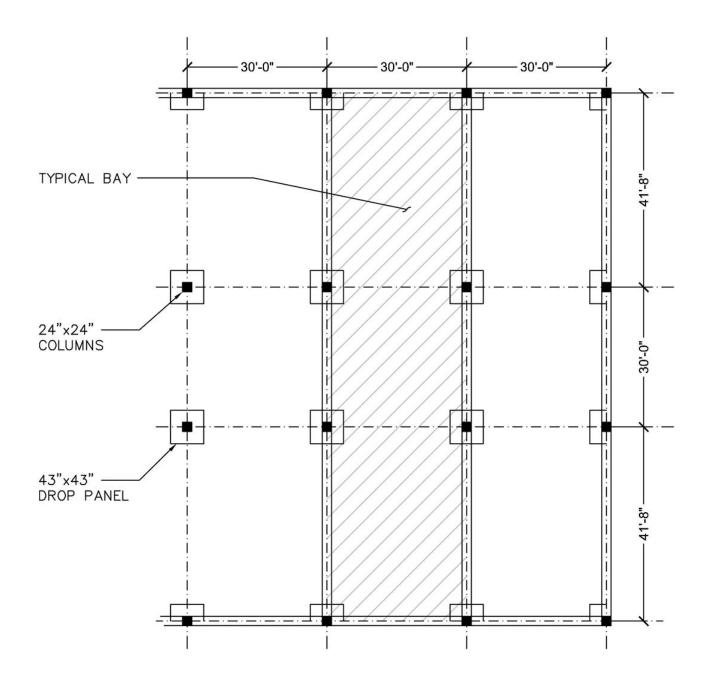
TYPICAL POST-TENSION SLAB LAYOUT
